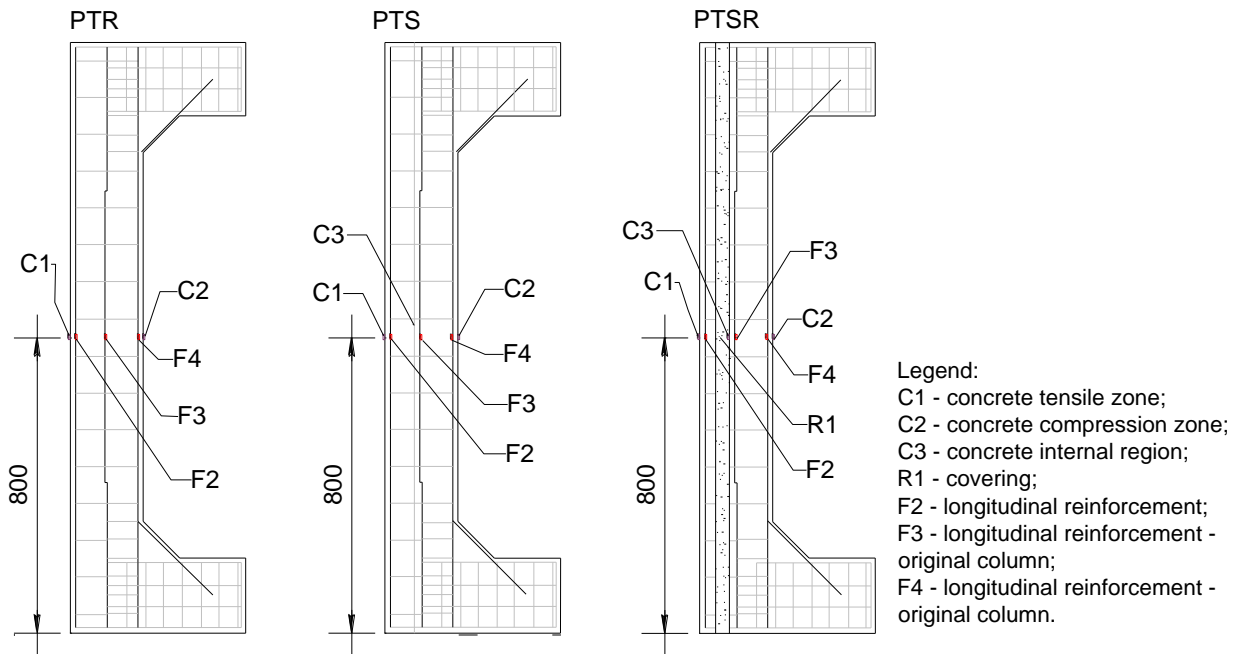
Extensometers on the rebar and concrete of the tensile zone strengthened columns.
